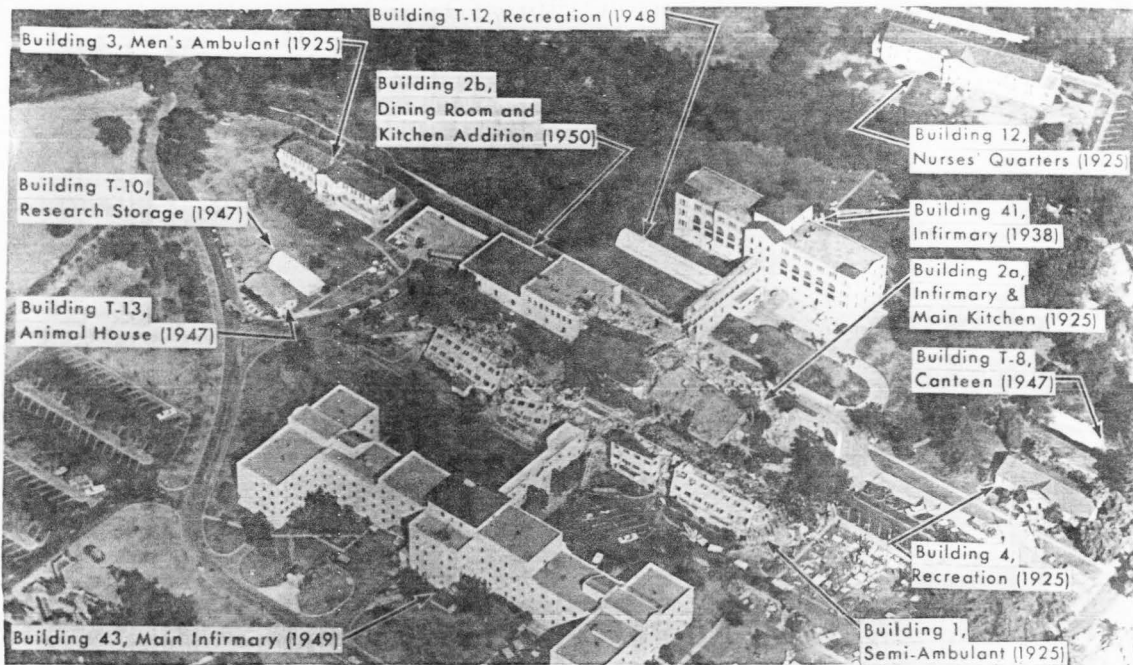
Aerial view of the San Fernando Veterans Administration Hospital. Collapsed building (No. 1 and 2a) constructed in 1925, where 46 patients and hospital workers were killed. Many of the buildings, also constructed in 1925 (buildings 3, 4, and 12), although still standing, were severely damaged (after Lew, Leyendecker and Dikkers, 1971).
